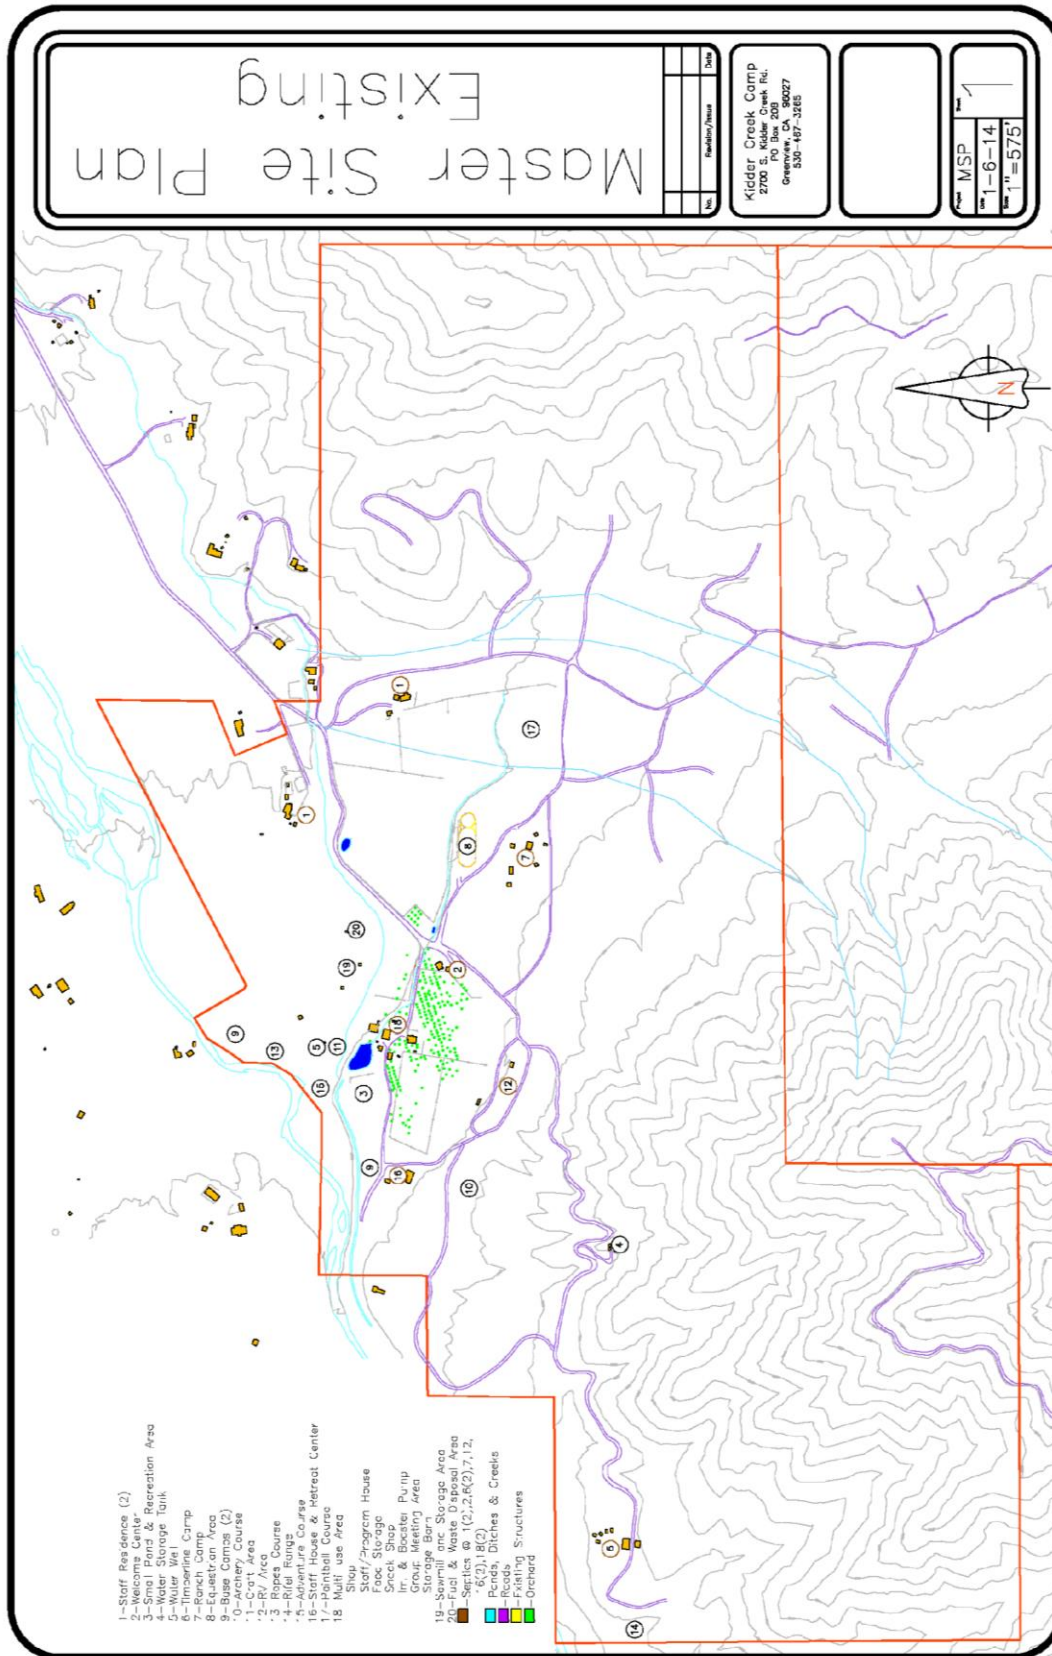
, Existing Master Site Plan Map (not to scale)
